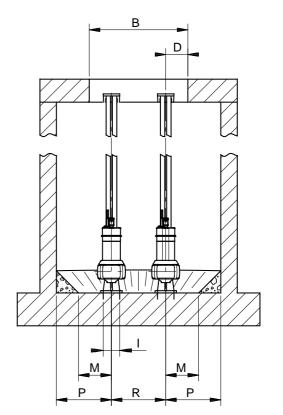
Dimensional sketch, two-pump installation on auto-coupling system
